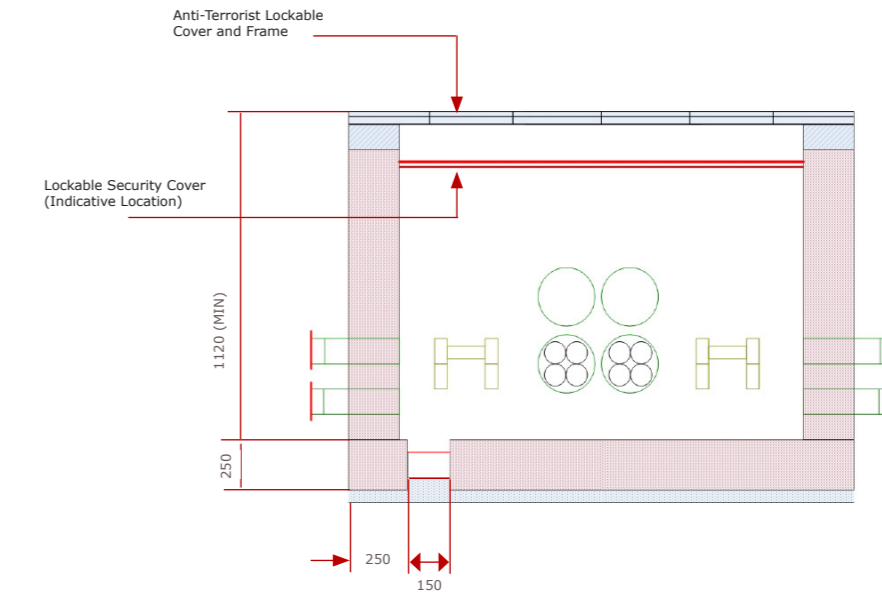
Typical Cross Section of Concrete Carriageway Chamber
